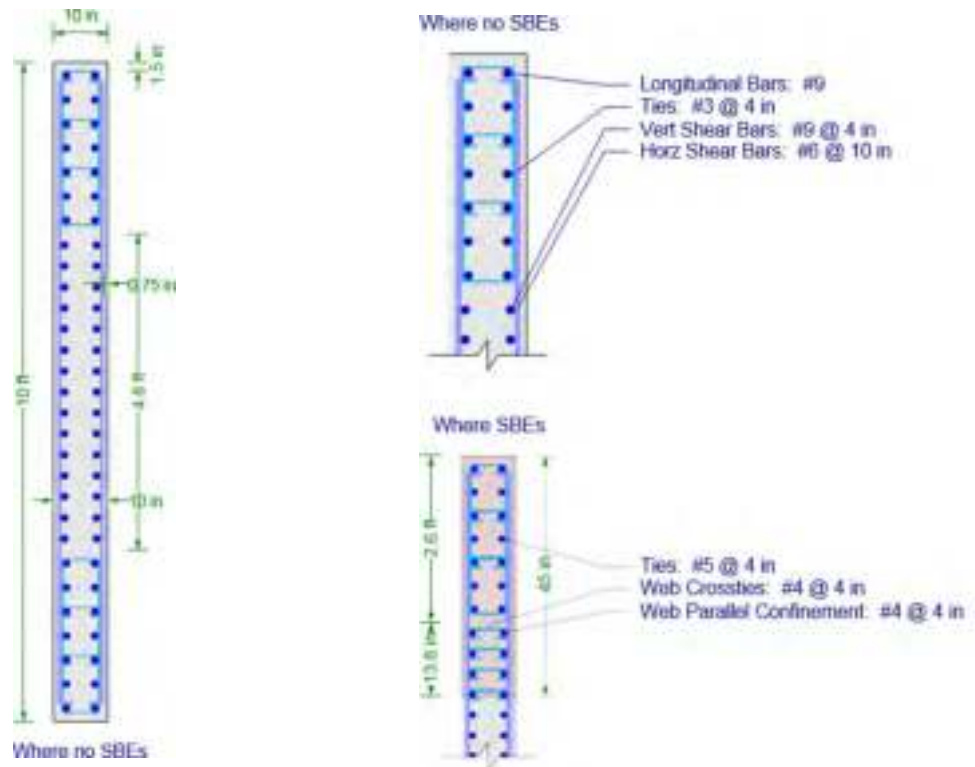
Building (B2-6S-M-S) Special RC Shear Reinforcement Details; Wall Section for Floors 1-3
